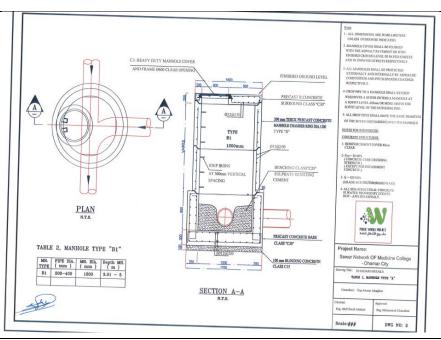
typical cross-section for the details of Manhole Types 1 and 2.
